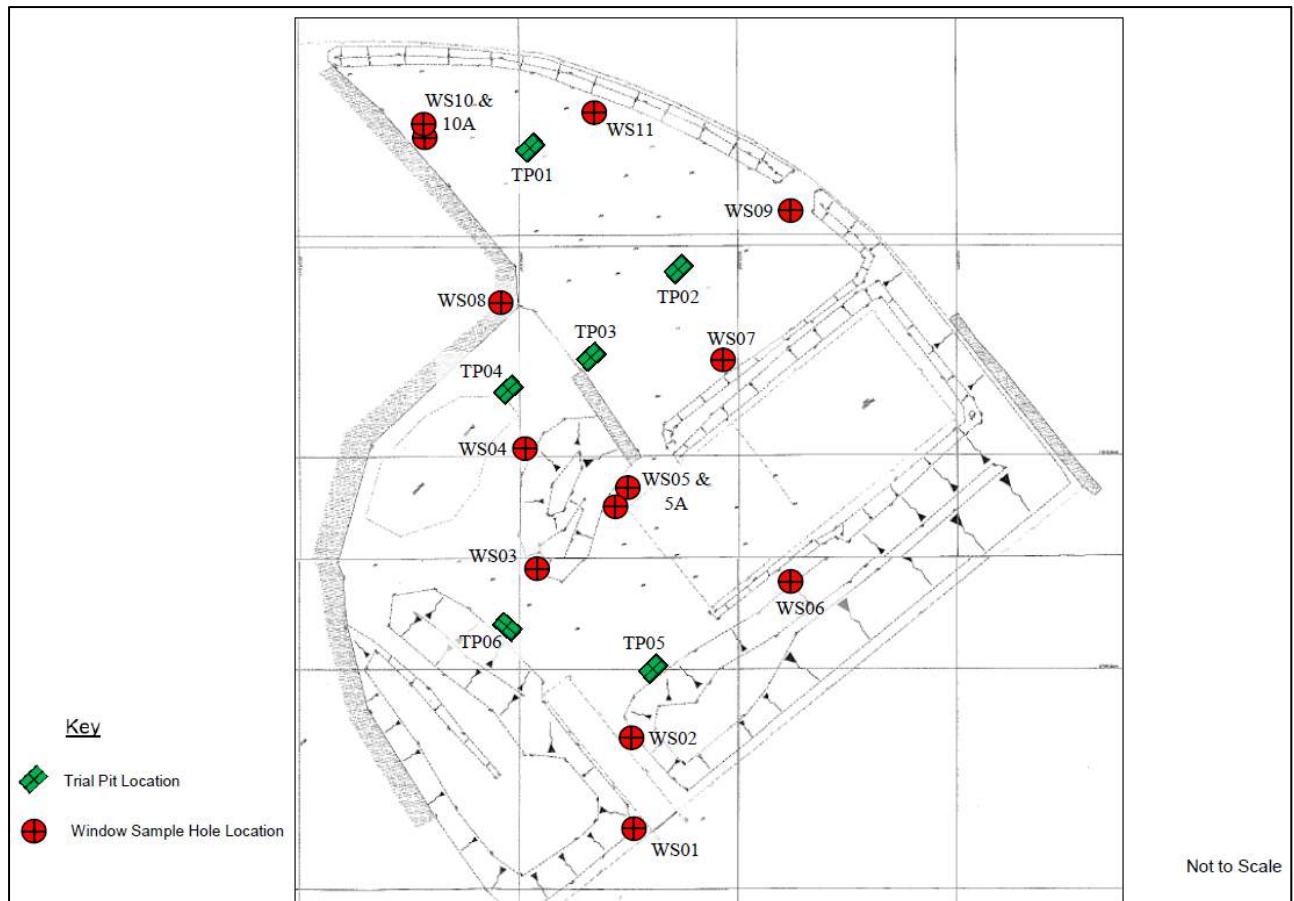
Exploratory Hole Plan using existing site layout as a base map.
